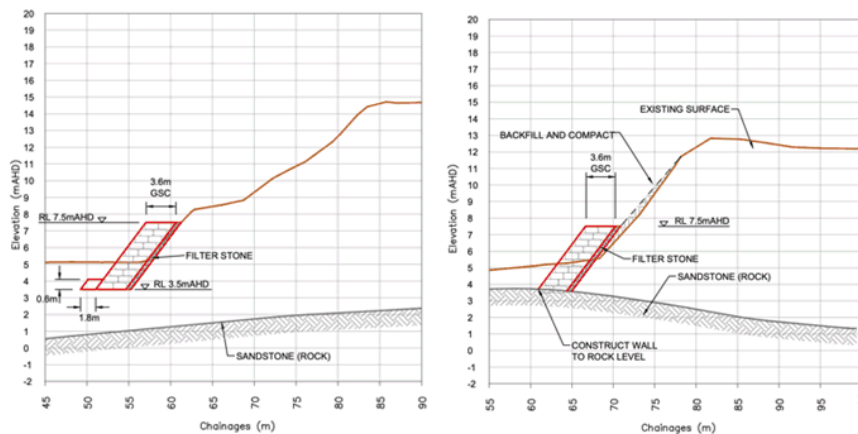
Concept Sketch of exposed GSC revetment showing cross section A (southern section, left) and F (northern section, right)
